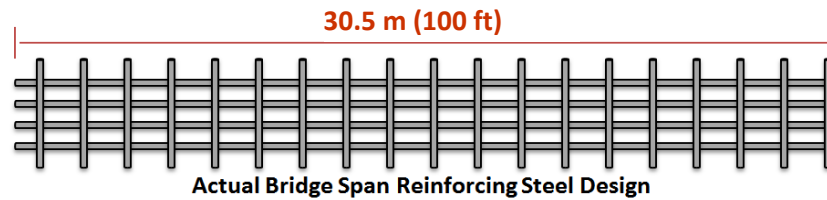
Typical reinforcing steel mat used on a railway bridge span
